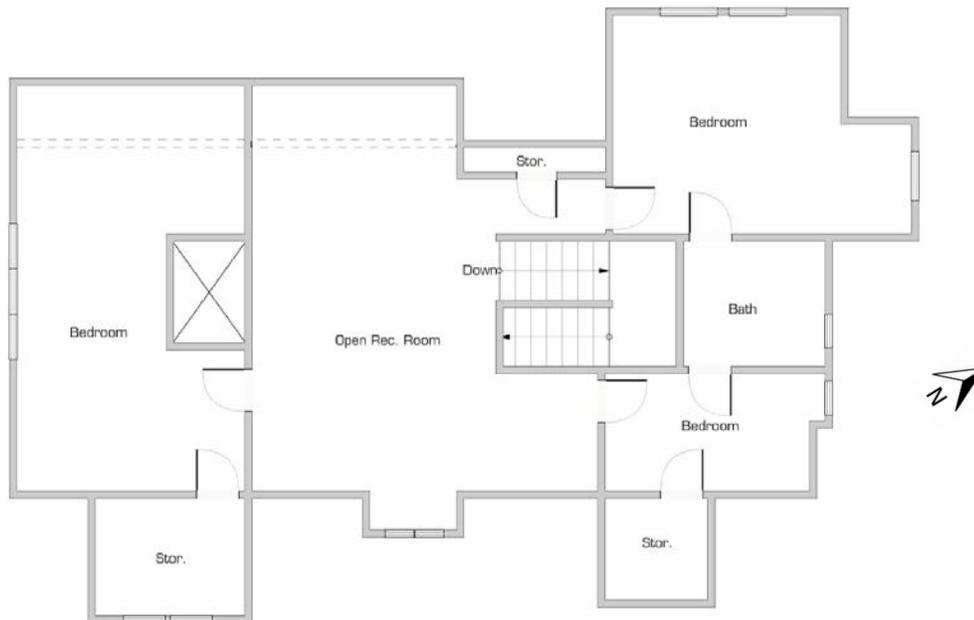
Attic Floor Plan. Not to scale; room divisions are approximate. Delineator: Peter Henne.
